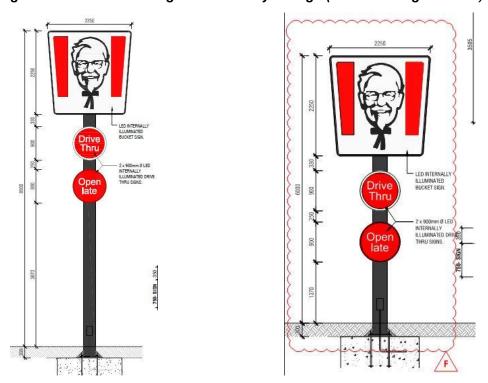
Original and Revised Pylon Sign (Voda Building Services)
